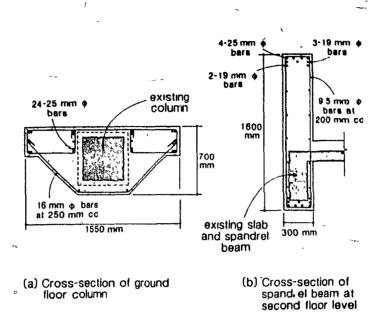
Typical Enlarged Edge Column and Edge Beam along Column Lines A and 1.
